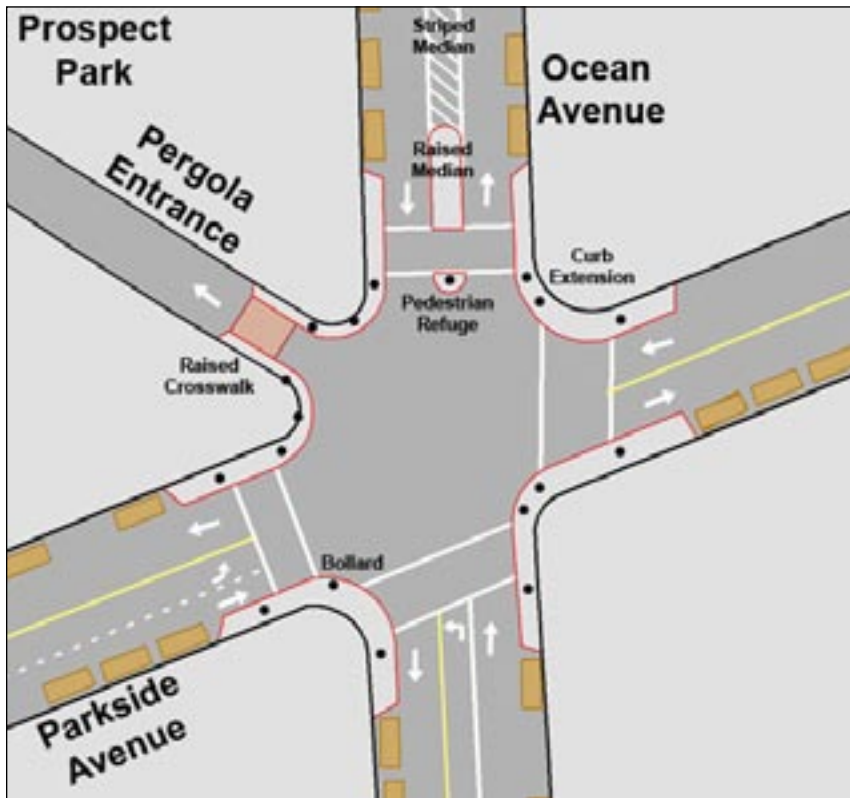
Parkside Avenue and Ocean Avenue intersection with curb extensions, raised crosswalk, raised median, pedestrian refuge and bollards.
